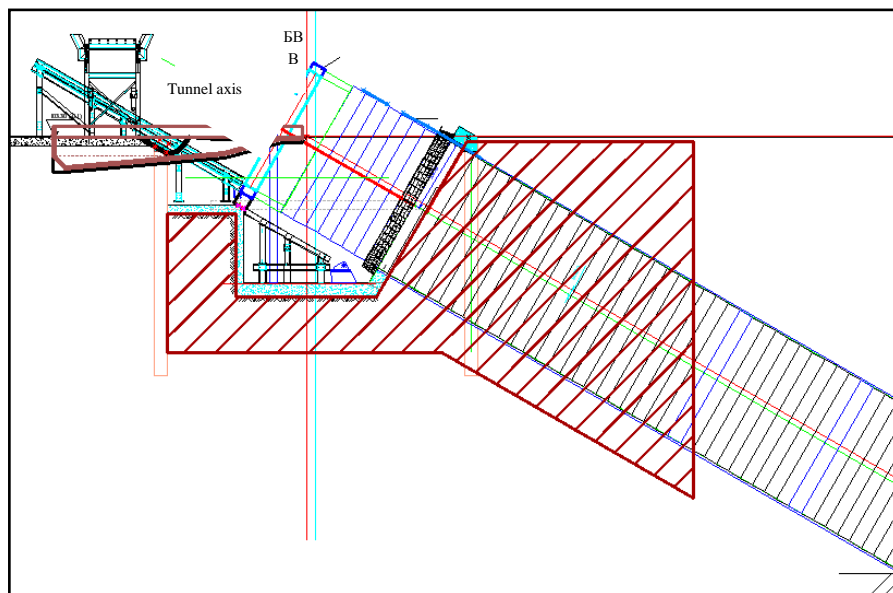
Jet grouting of soils during construction of the escalator tunnel at the Spasskaya underground station – Cross-section along the tunnel axis
